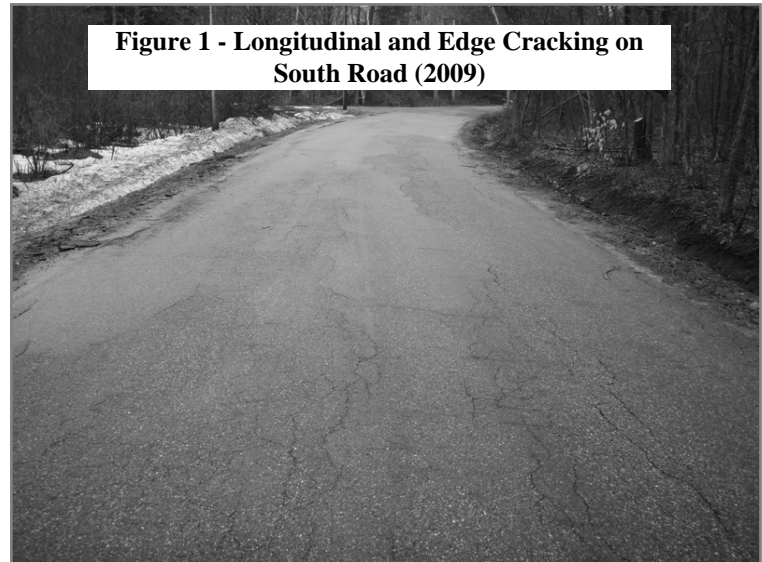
Longitudinal and Edge Cracking on South Road (2009)
